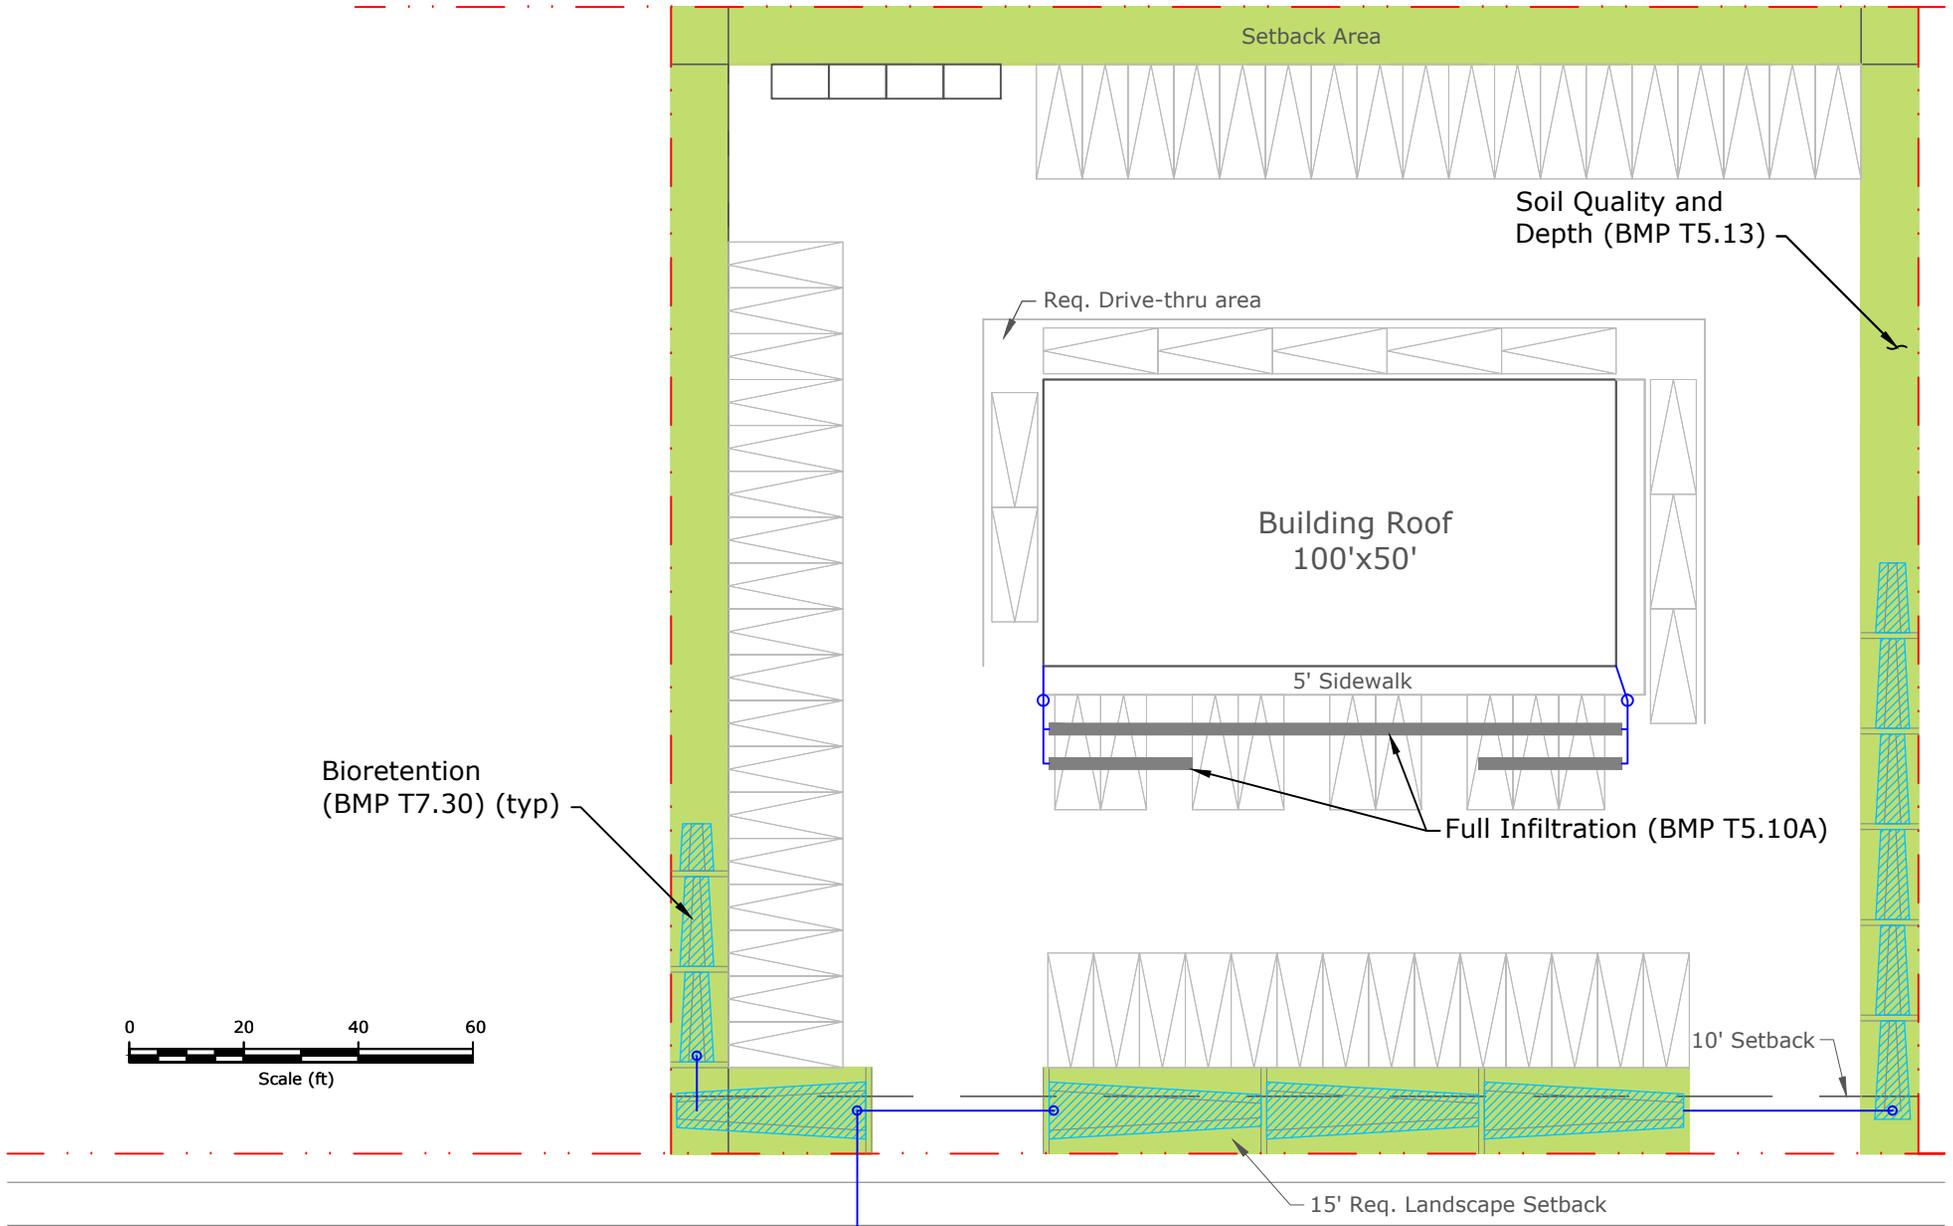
Scenario 9. Permanent Stormwater Site Plan – Small Commercial Development, 2012 Requirements, Outwash Soils
